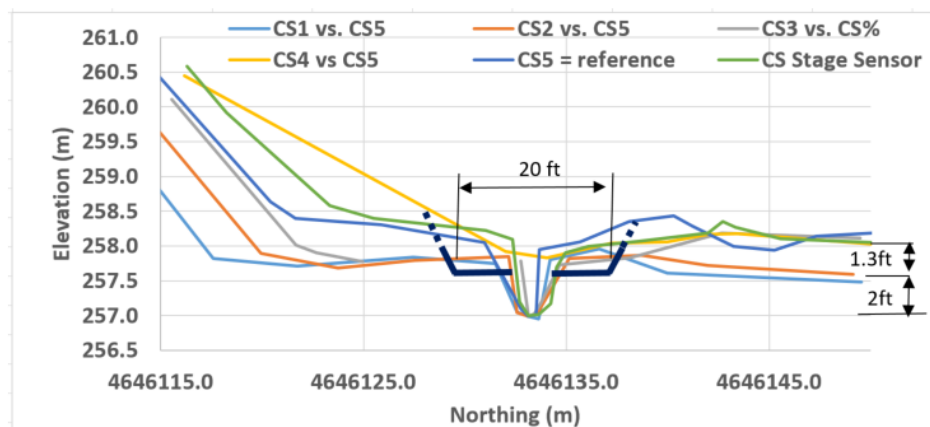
Co-located cross-sections of the ditch showing dimensions of the existing channel and proposed bench dimensions.
